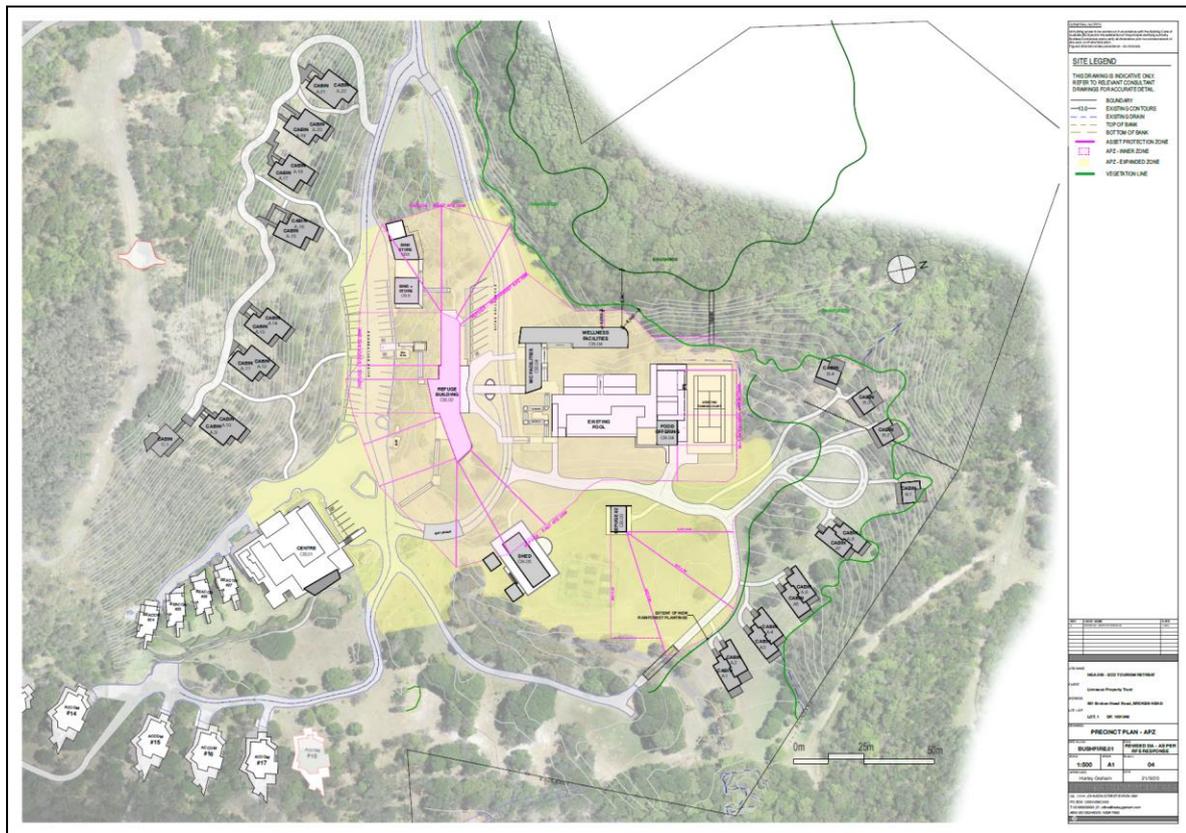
Potential further expansion of the asset protection zone (yellow shading) beyond that required by the refuge building.
